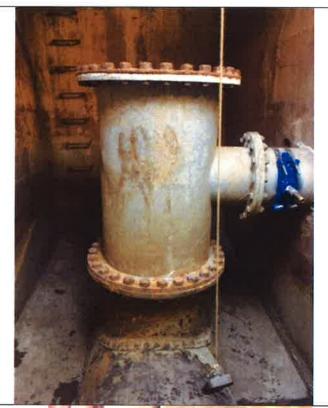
30-inch by 16-inch tee installed in 1966 for water treatment plant modifications (looking west). Tee is tilted
